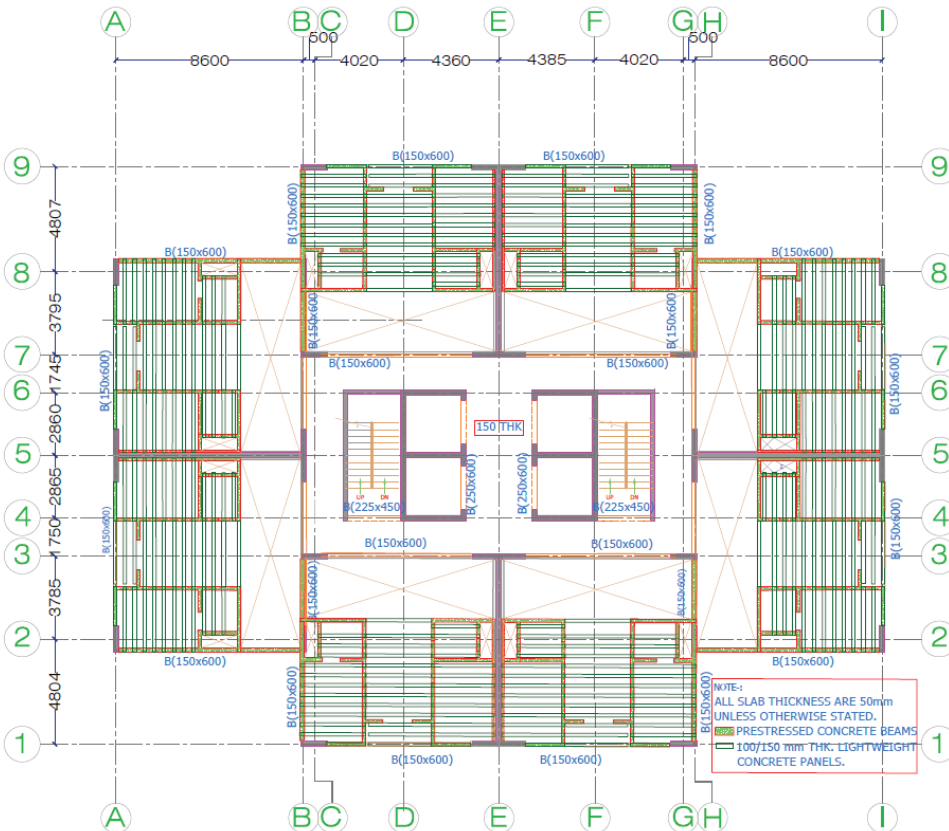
Duplex Building General Arrangement of Intermediate Floor (Mezzanine) Level
